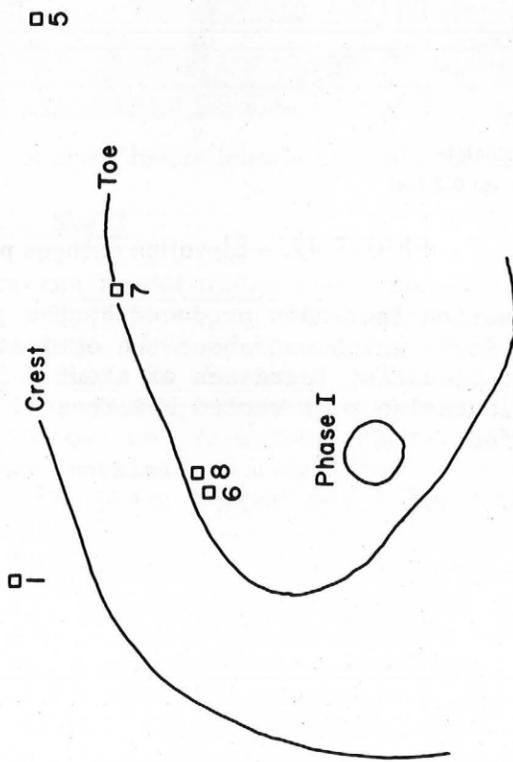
Plan view of blast vibration gage locations for the phase I blast.
